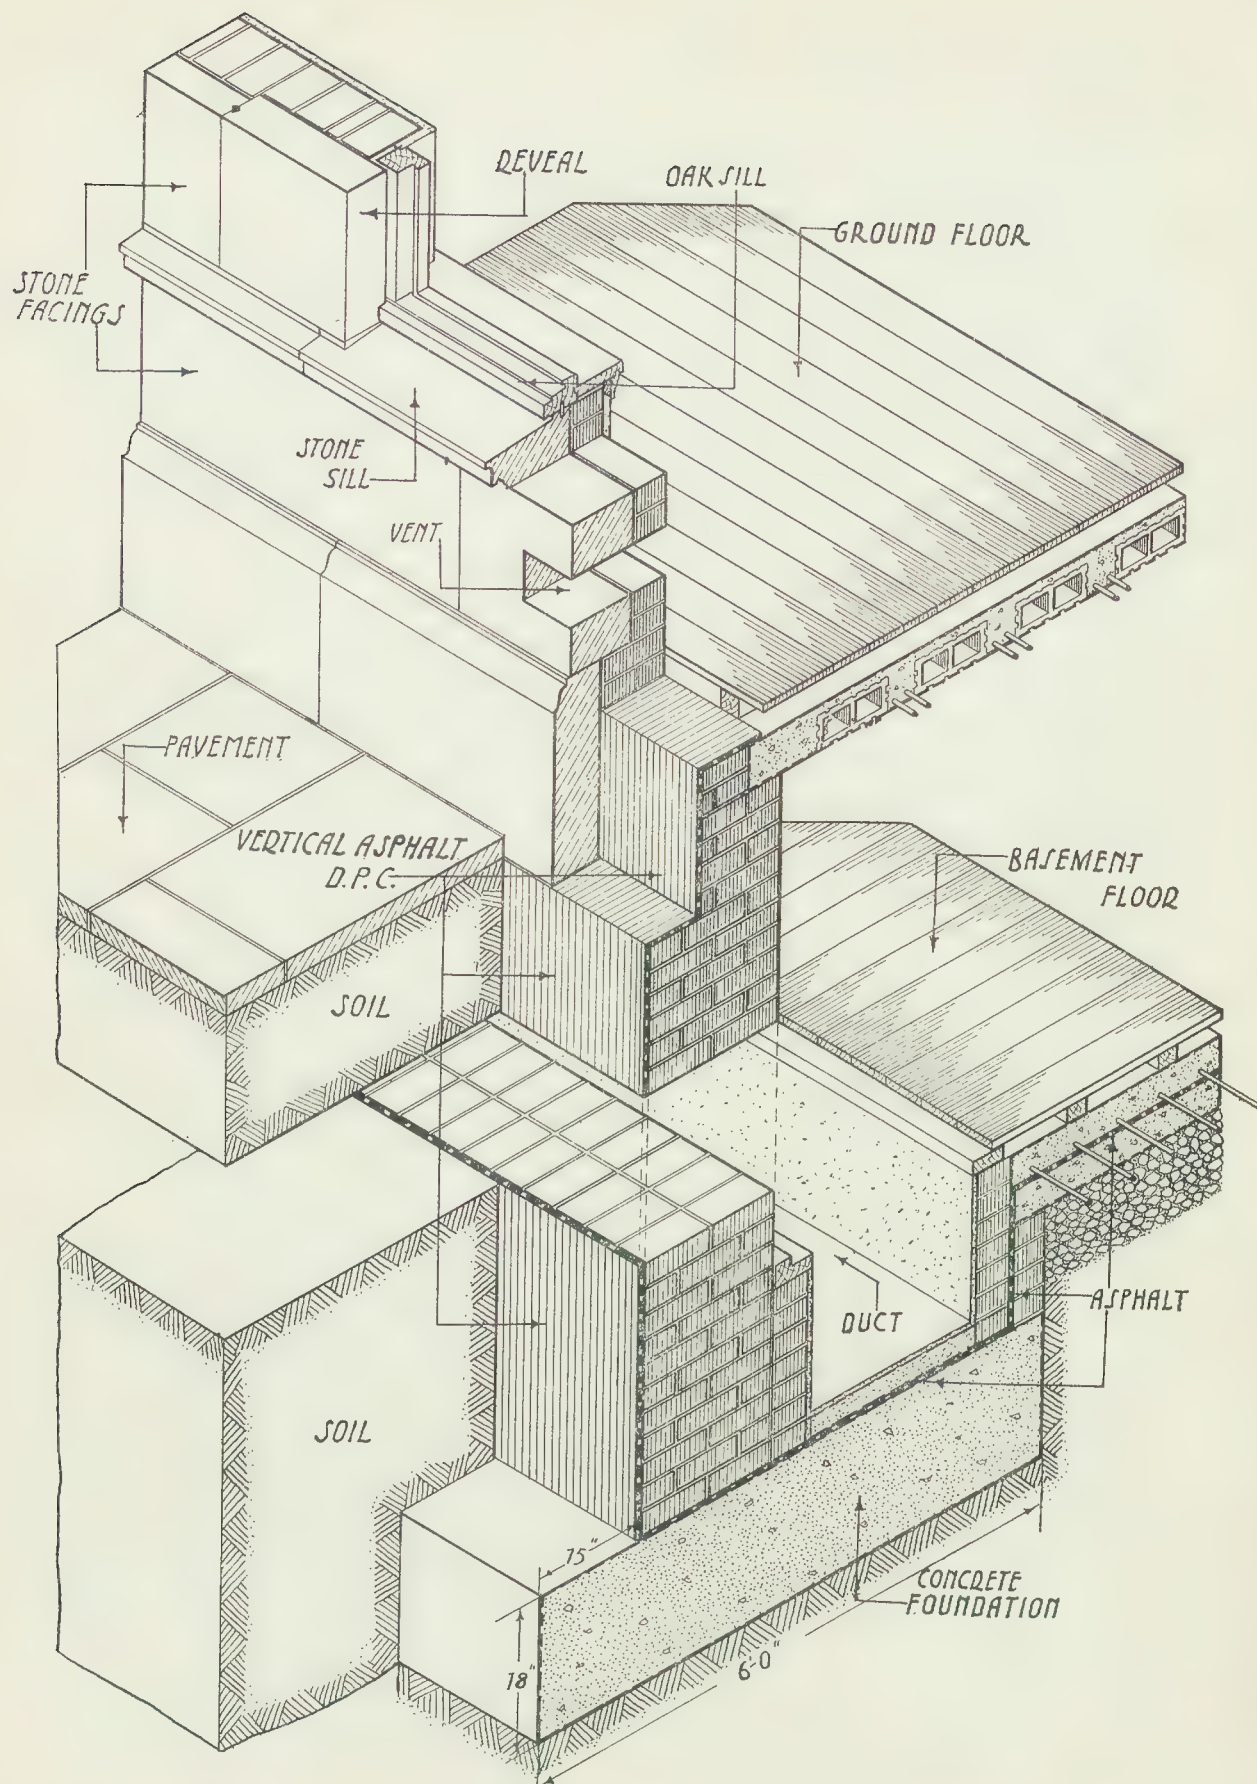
DAMP-PROOFING BASEMENT FLOOR AND WALLS
